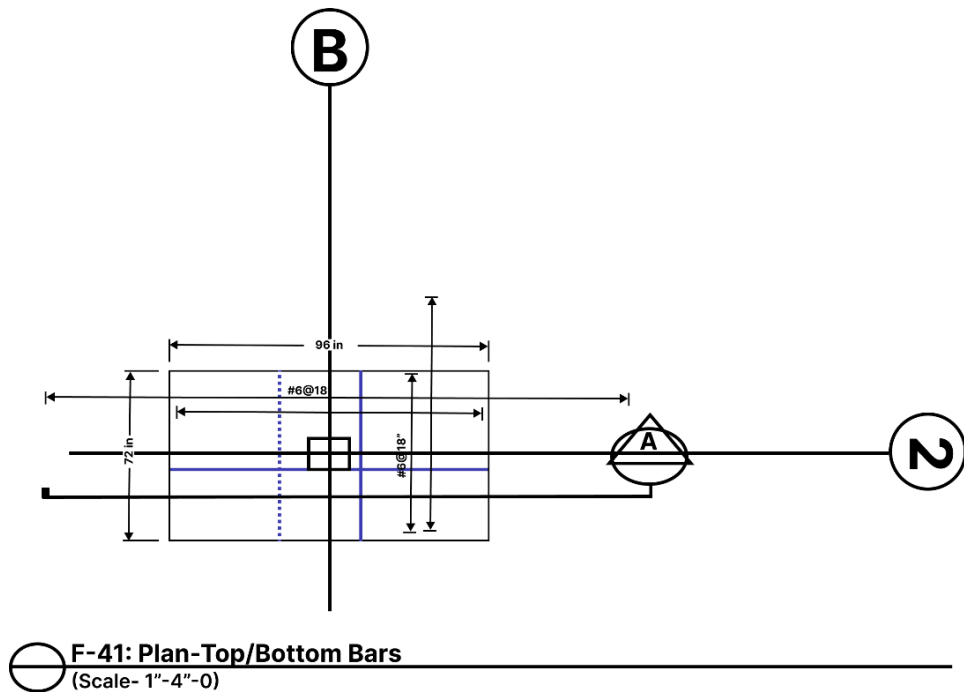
Footing F- 41 Plan -top/bottom Bars (96"x72"), Height 18"
